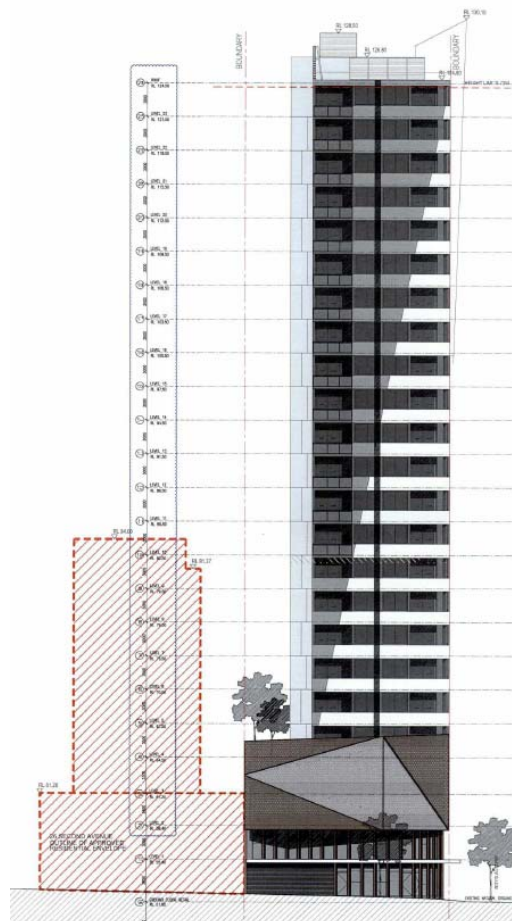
Extract of the approved street elevation plan for 28 Second Avenue (right). The approved building envelope for a 9 storey mixed use development approved at 26 Second Avenue (left) is outlined in red (Source: Tony Owen Partners, February 2015).
